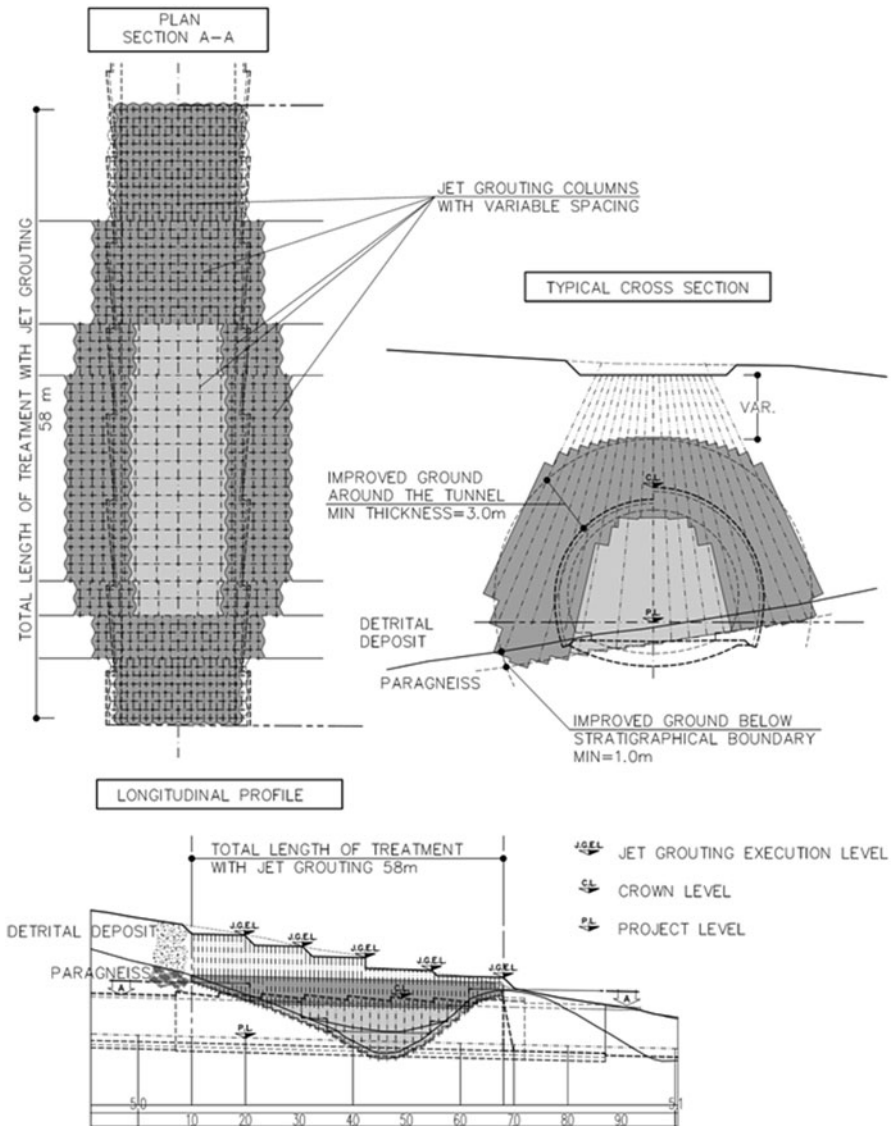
Jet-grouting soil improvement at the portal with low overburden. Scheme of the positioning of the treatment, cross section, layout of the portal area, and longitudinal profile
